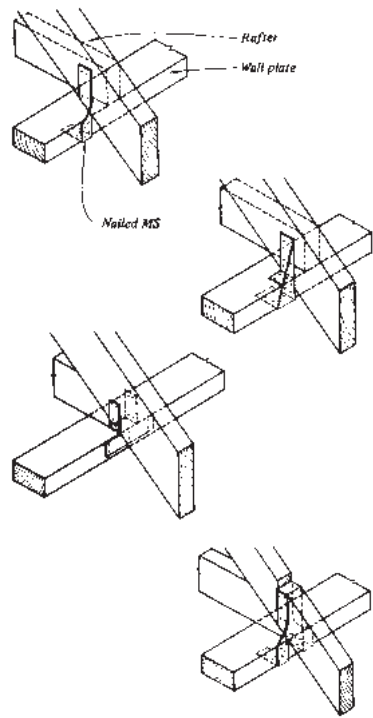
Rafter to wall plate connection (Arya, 1987, p. 18)
